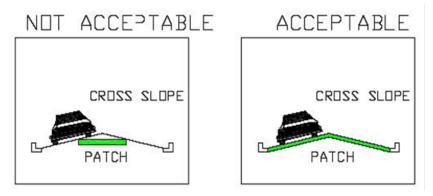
Example 11. Patch slope and grade must match existing pavement.
